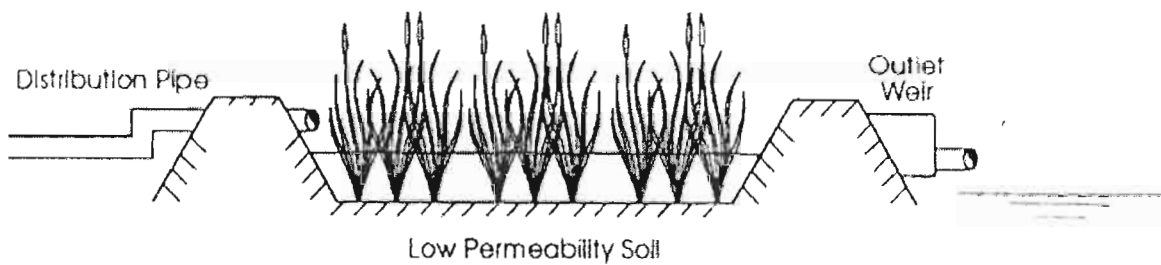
Typical cross sectional layout of a FWS constructed wetland (Kadlec and Knight 1996).
